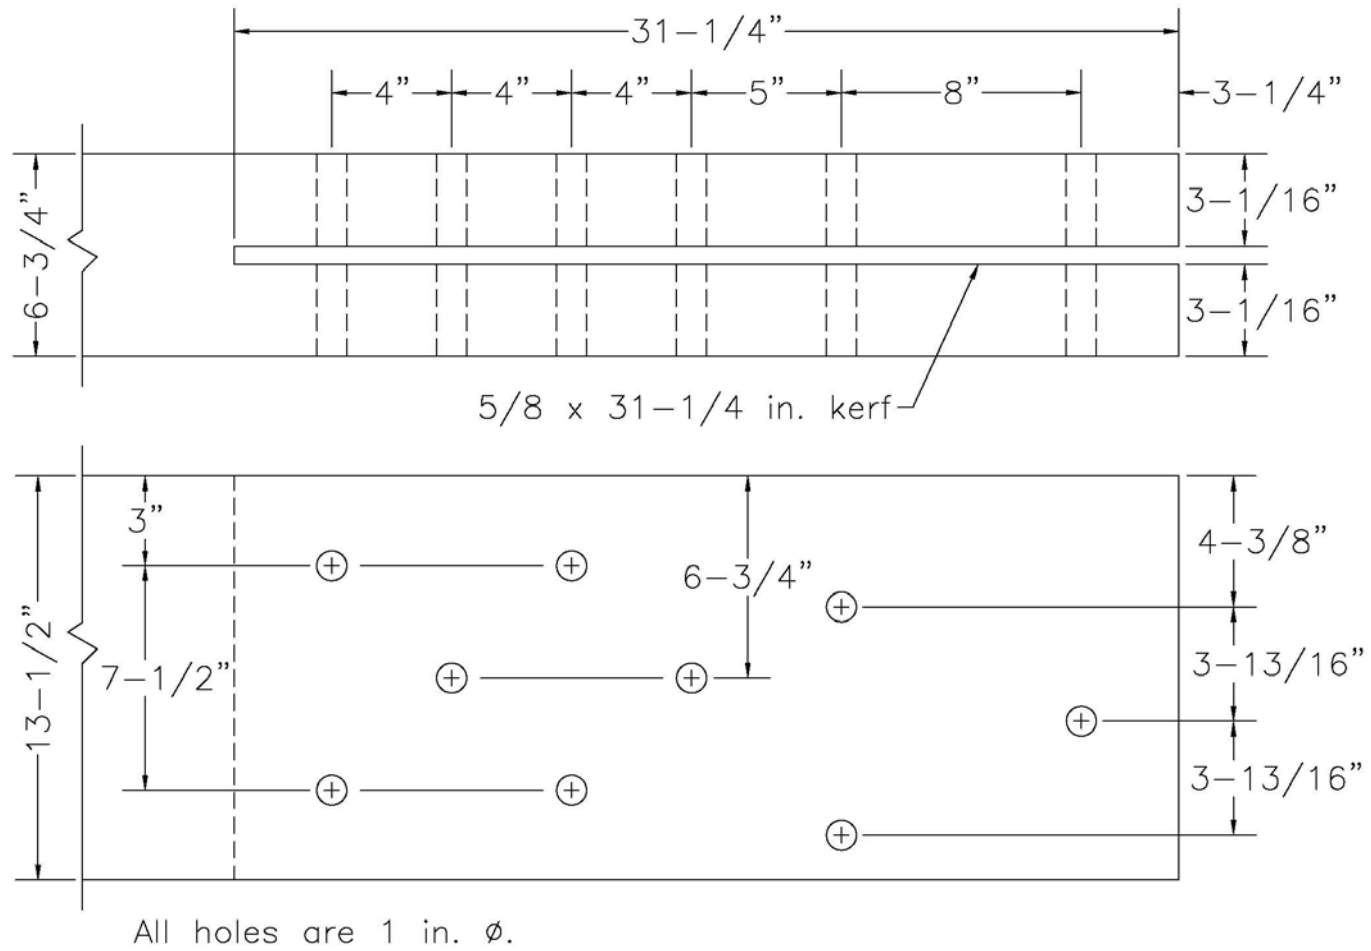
Boring Detail - Glulam Rail End at Approach Guardrail Transition
